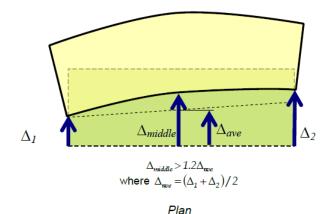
DEFINITION OF FLEXIBLE FLOOR DIAPHRAGM
